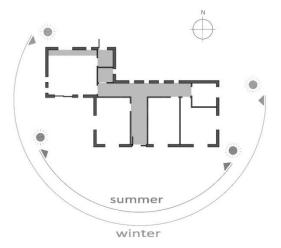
Narrow plan design, no need to sacrifice floor area required. All rooms benefit with more exposure to light and solar gain.
